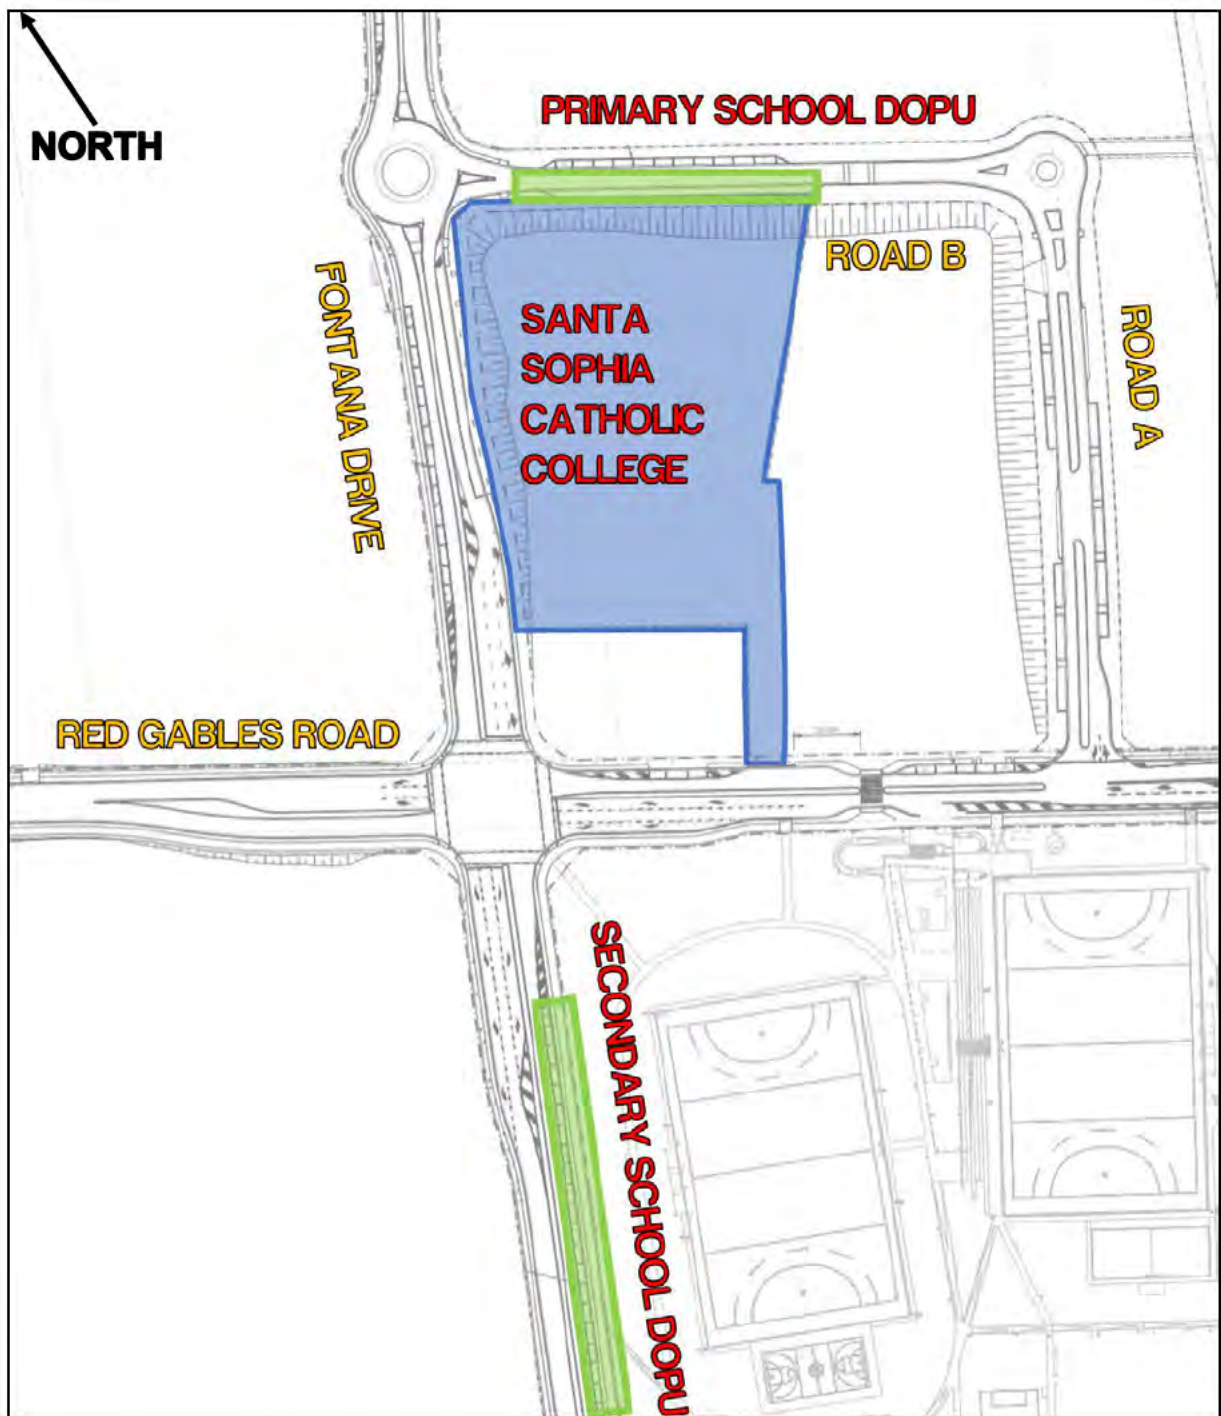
Proposed Pick-Up / Drop-Off Facilities
